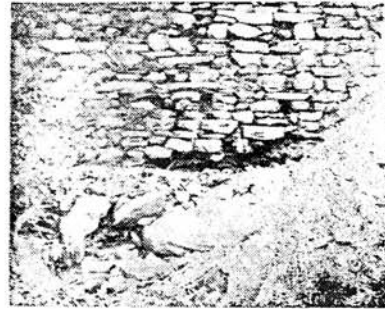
Toe wall at bottom dissipates the energy of falling rain water and avoids toe erosion
